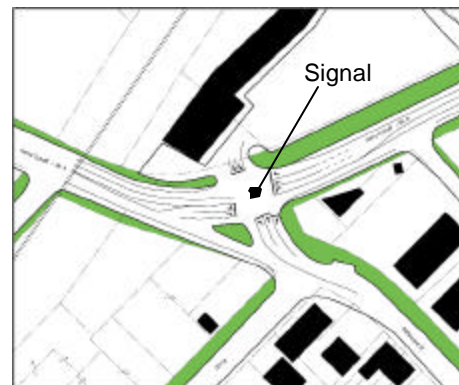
Existing configuration of intersection at Delaware Street and Route 9
